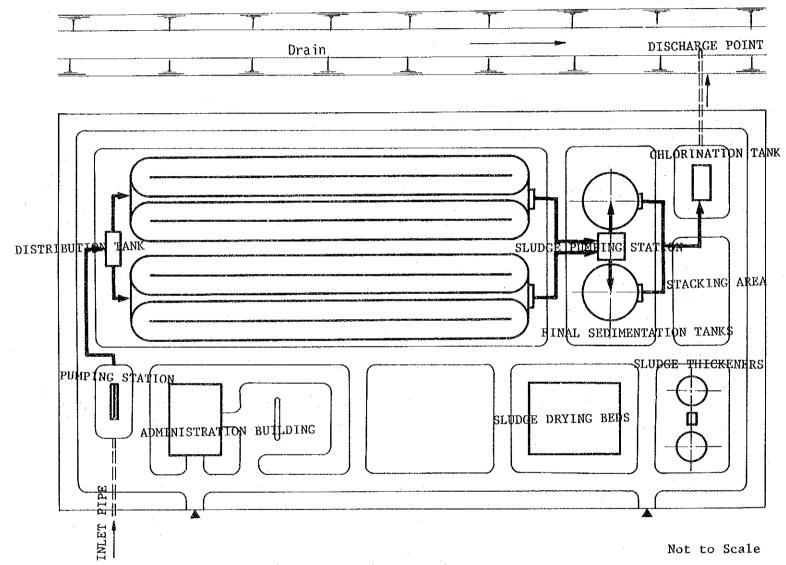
<u>Sewage Treatment Plant Layout Plan</u>
